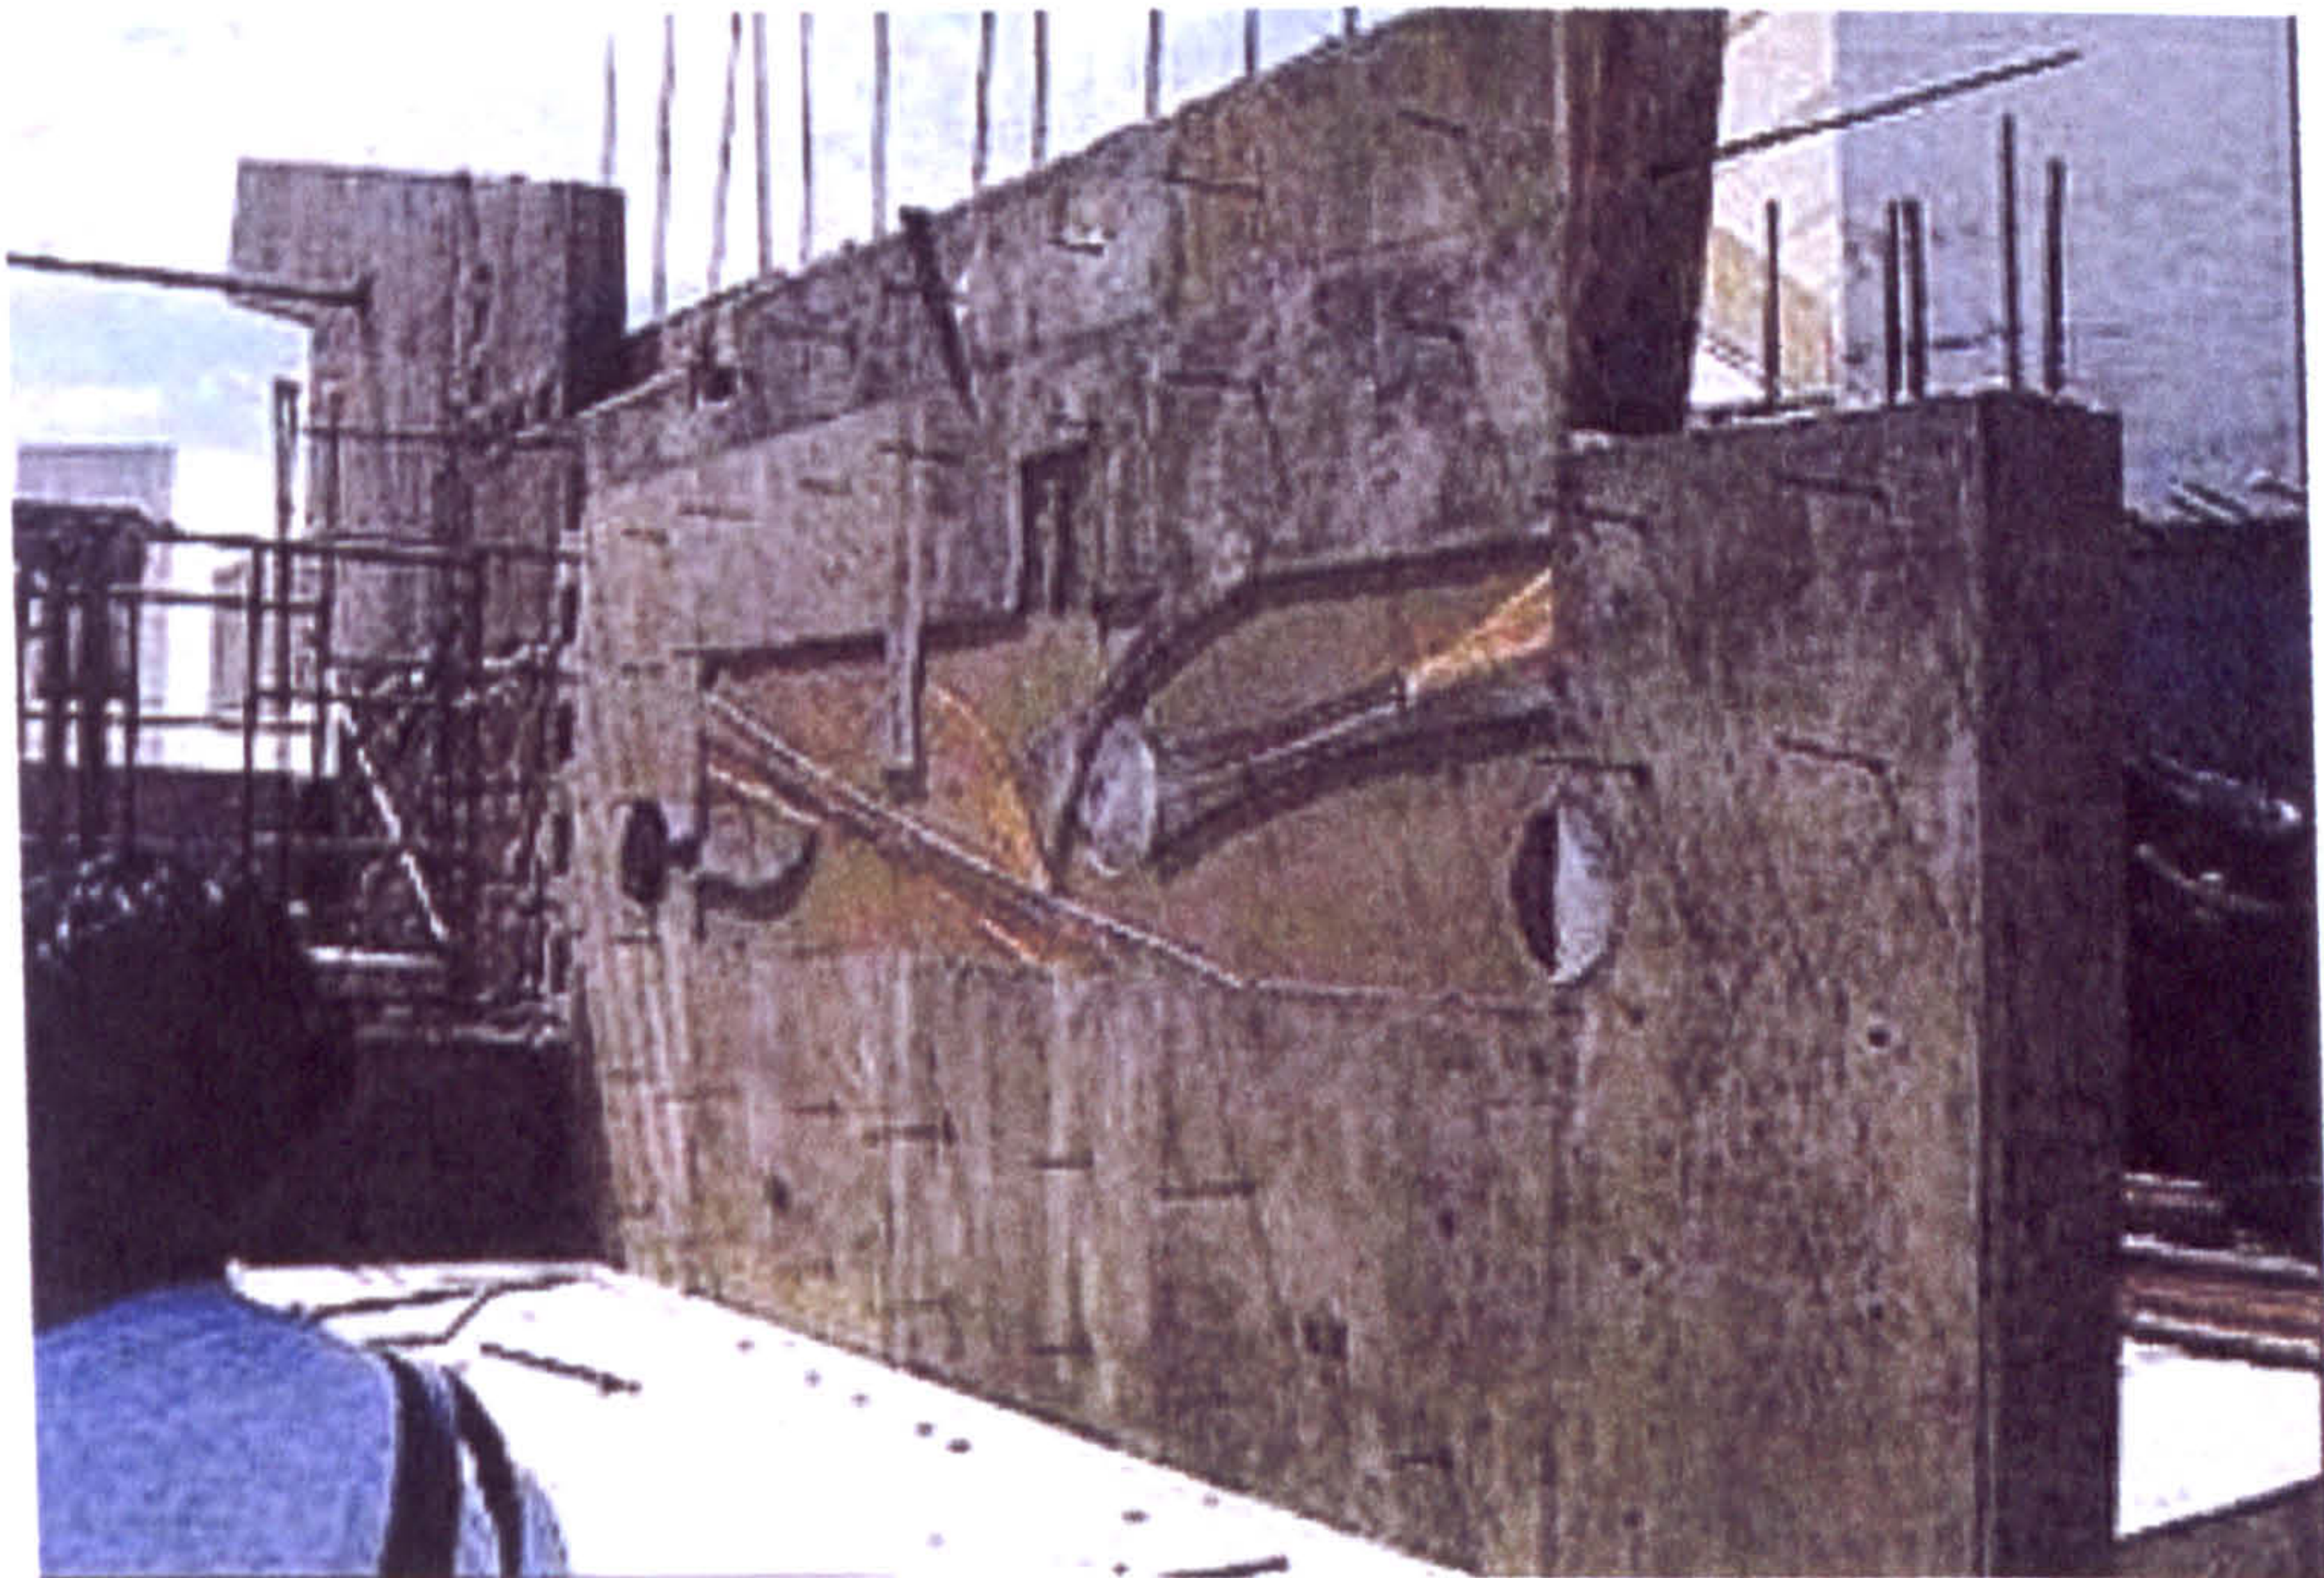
East Crescent Housing Silt cast motif on unit 5 wall
